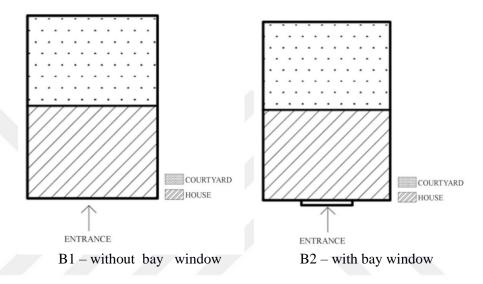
Plan typology of the house with middle entrance, with and without bay window (B1 - B2 Plan Type) (S. Sevimbige archive, 2018)
